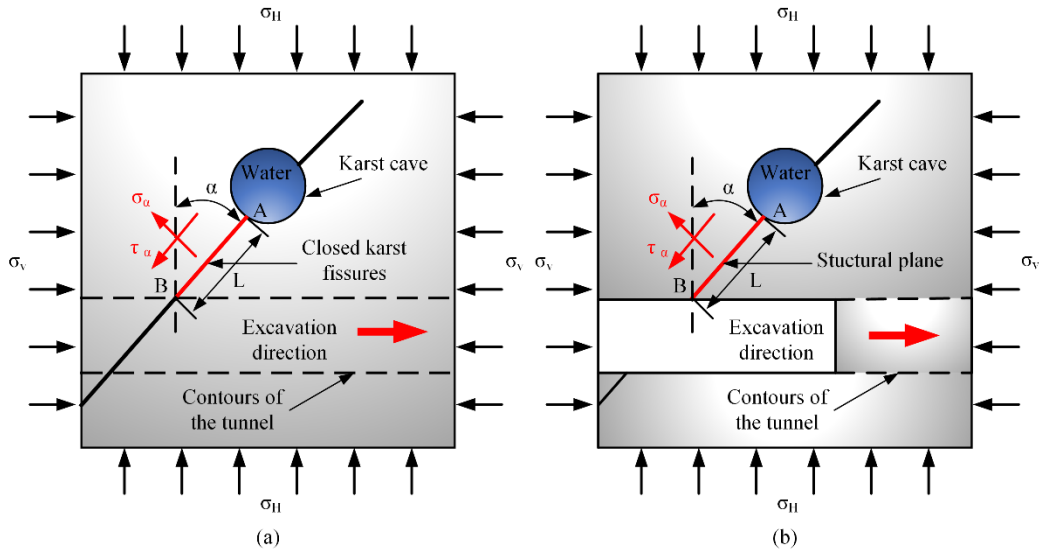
Mechanical model of surrounding rock with a structural plane. (a) Before tunnel excavation; (b) after tunnel excavation.
